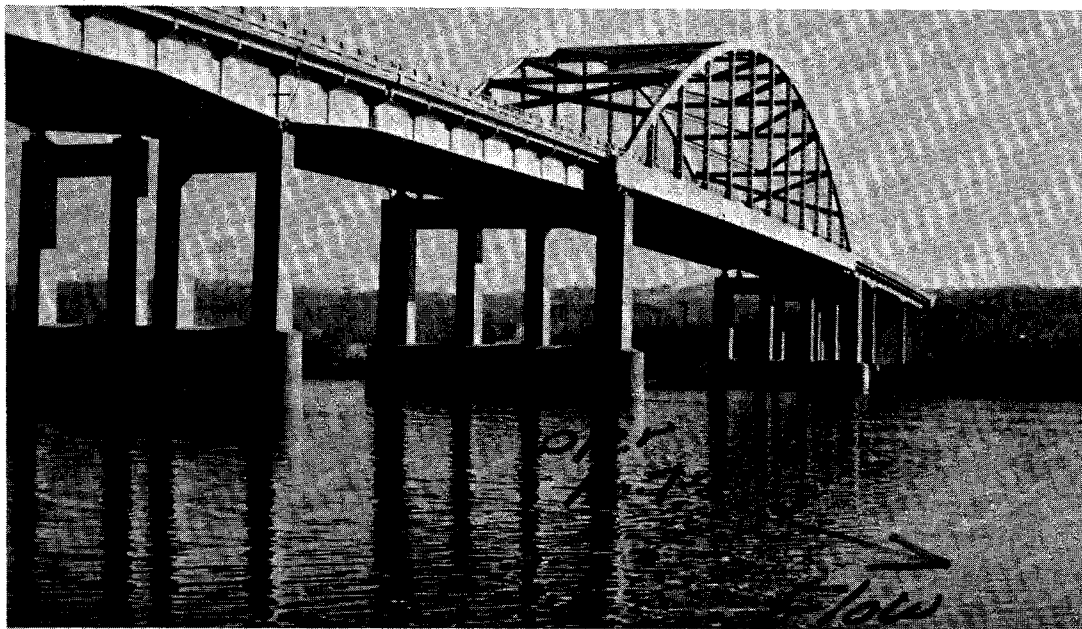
View upstream and toward left bank of I-494 bridge in January 1977. Pier 7 is at center.
